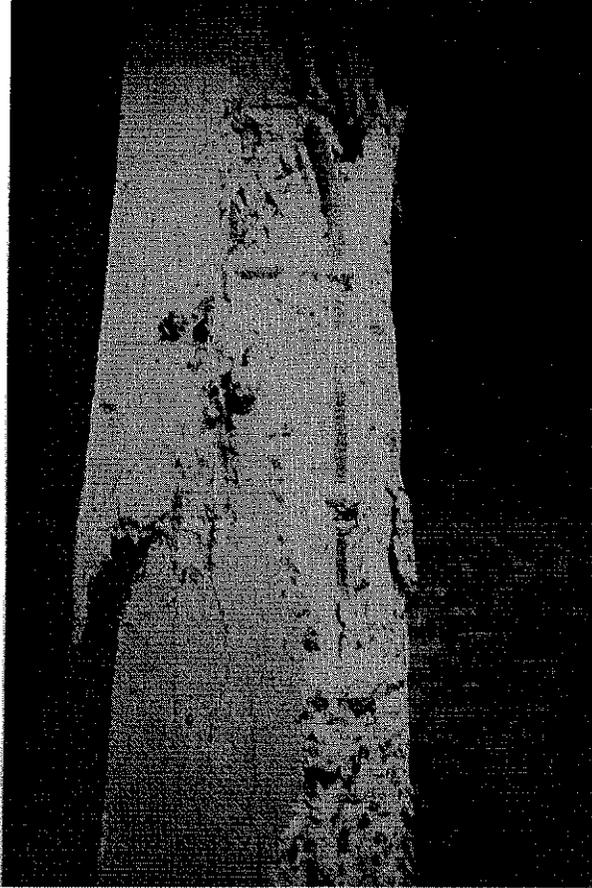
COLUMN NO. 4 (203 x 914 mm) AFTER TEST
